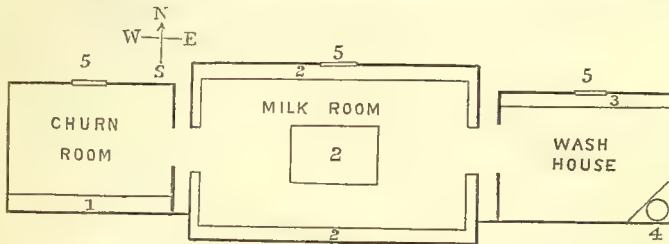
1, Bench for Butter-making ; 2, Benches for Milk-pans ; 3, Bench ; 4, Copper ; 5, Windows facing North.
